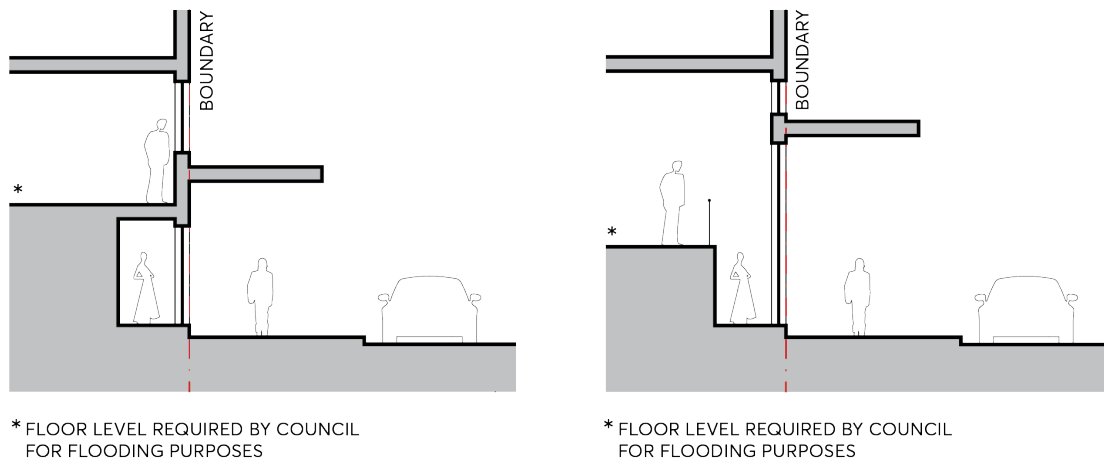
B – Active Ground Floor: Floor level required up to 1.5 metres above footpath level
